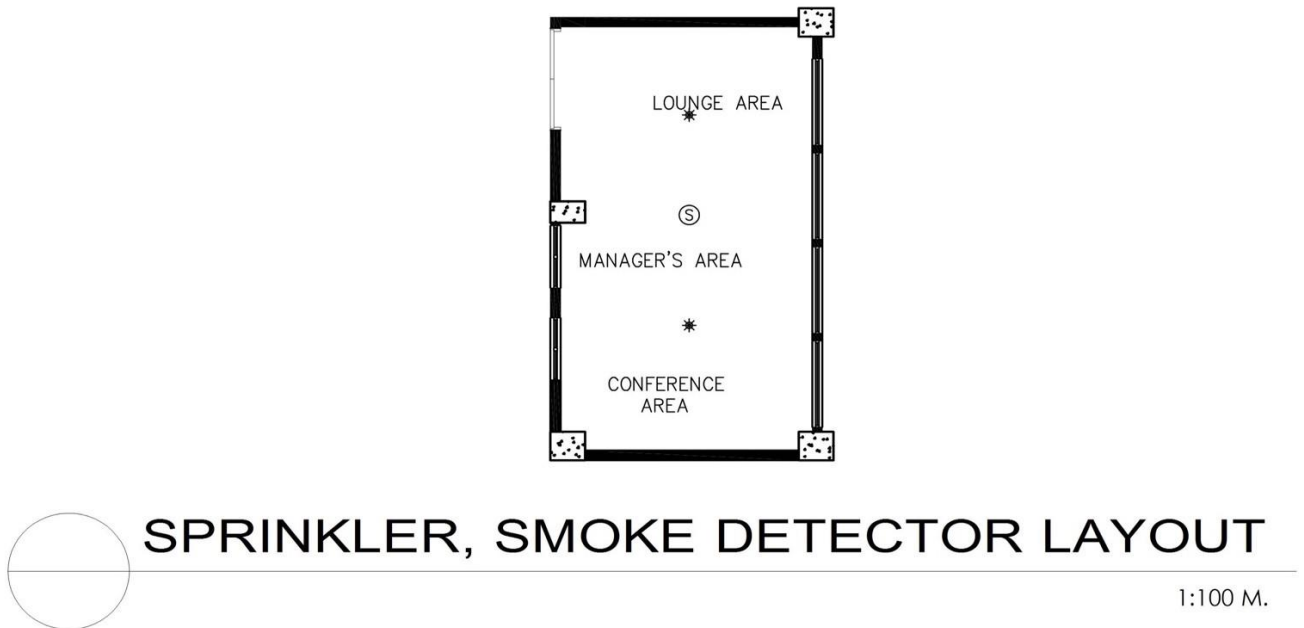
Smoke and Sprinkler Detector Plan Elevation
